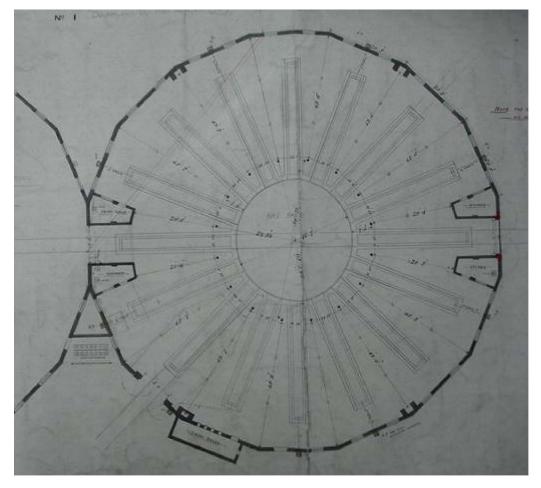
Plan of RH1, as re-designed c. 1890 by W. Bell (NA RAIL 527.590)
